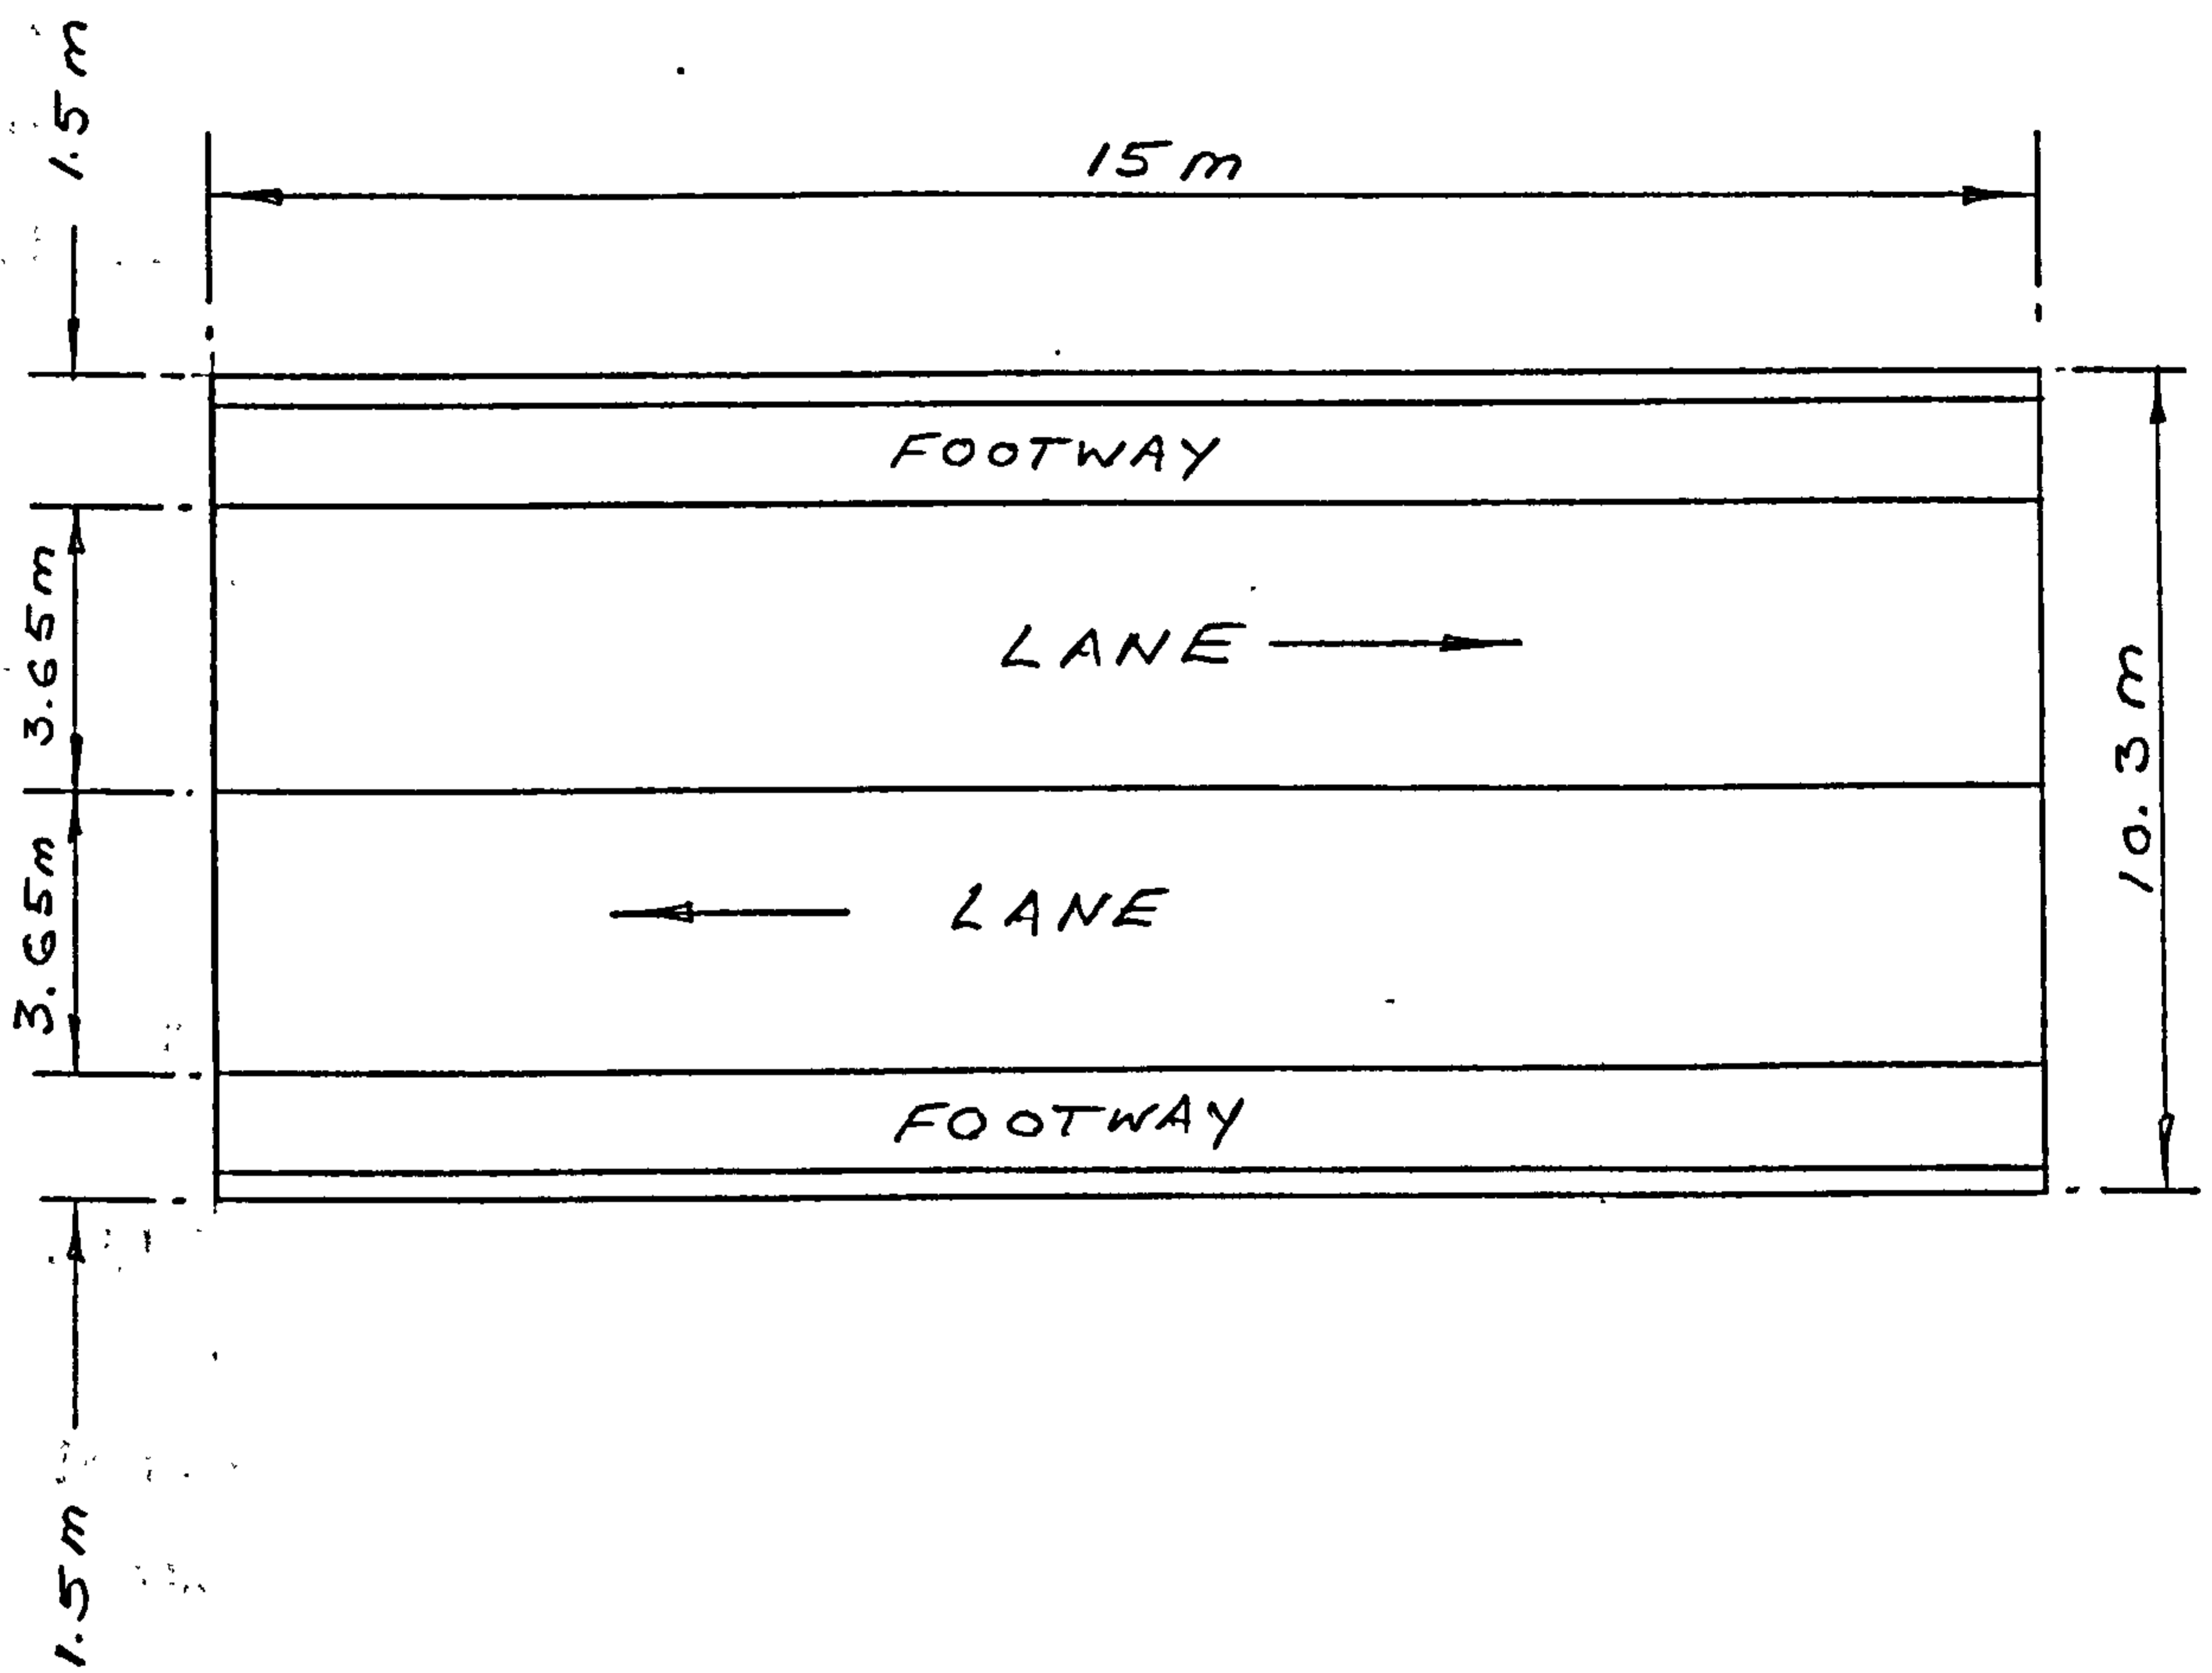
A 15m span two lane single carriageway slab bridge.
